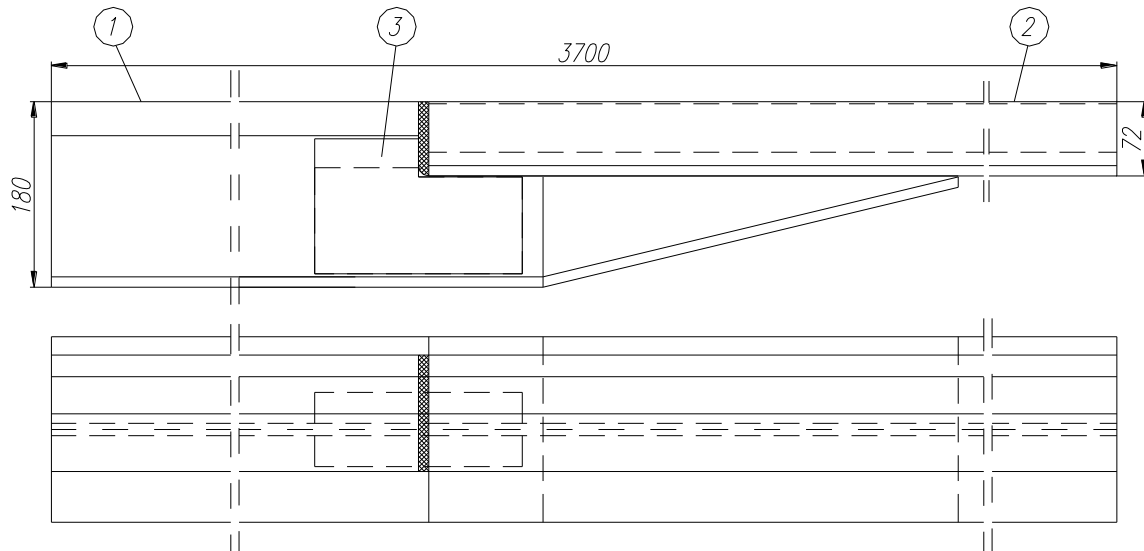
60R2 / LK1 connecting rail: 1- 60R2 rail, 2- LK1 block rail, 3- strengthening fish plates
